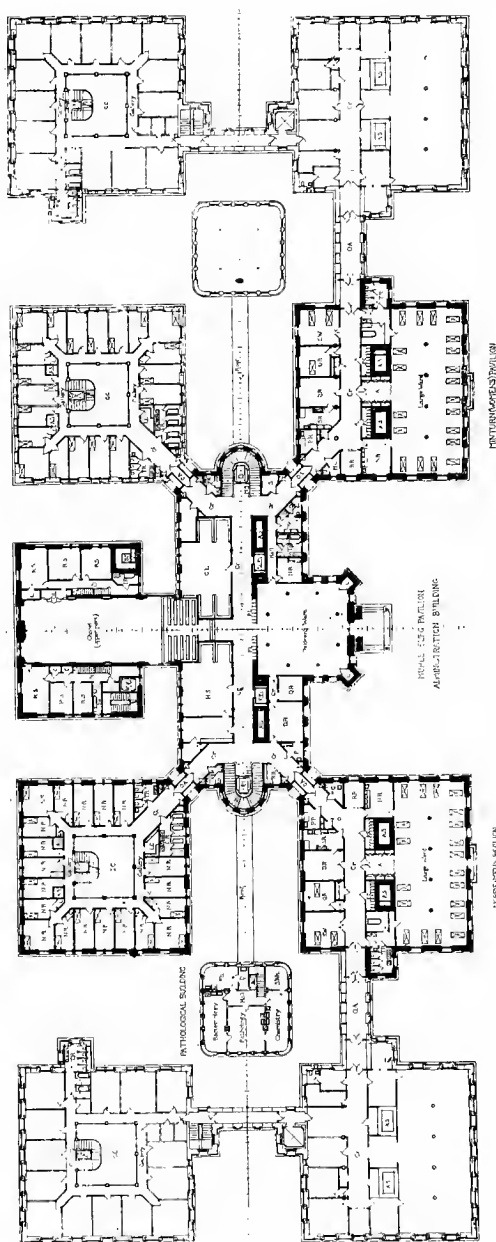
SECOND FLOOR PLAN OF ST. LUKE'S HOSPITAL, CATHEDRAL HEIGHTS, NEW YORK CITY.
